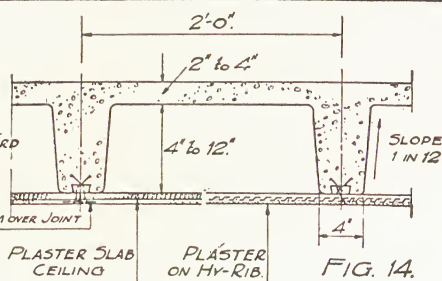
The "Truscon" floor. (By courtesy of the Trussed Concrete Steel Co., Ltd.)
